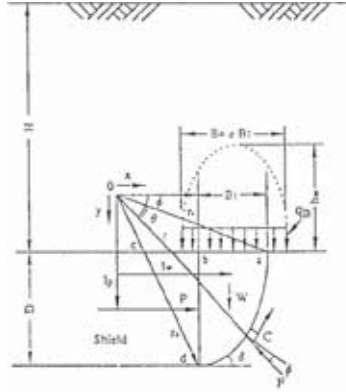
The tunnel-face stability model of the method of Murayama.
